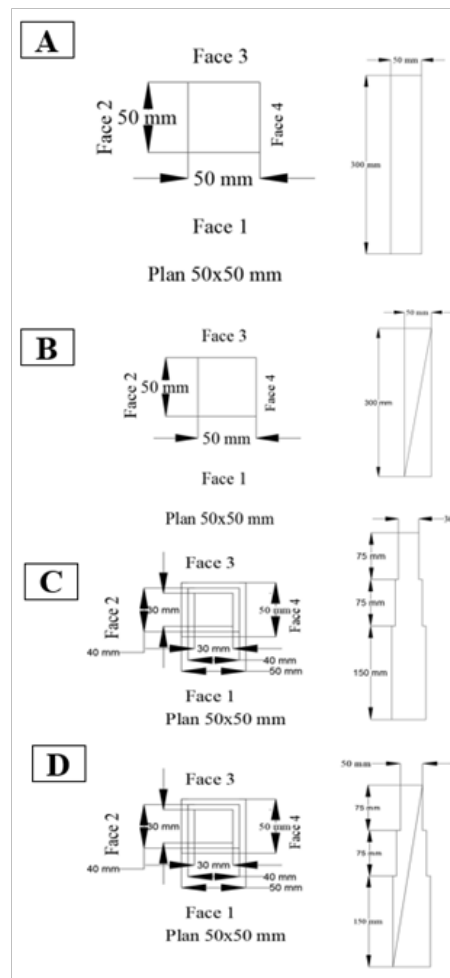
Plan and elevation for building models (A) Square Building (SB), (B) Twist Square Building at 45° (TSB), (C) Building with Setback (BS) on all sides, (D) Twist Square Building with setback (TSBS)
